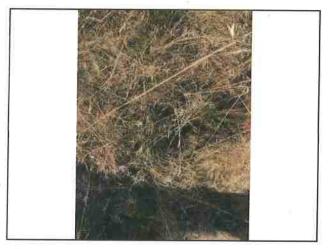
River Rd Possible Culvert In. No Culvert Out Was Identified.
